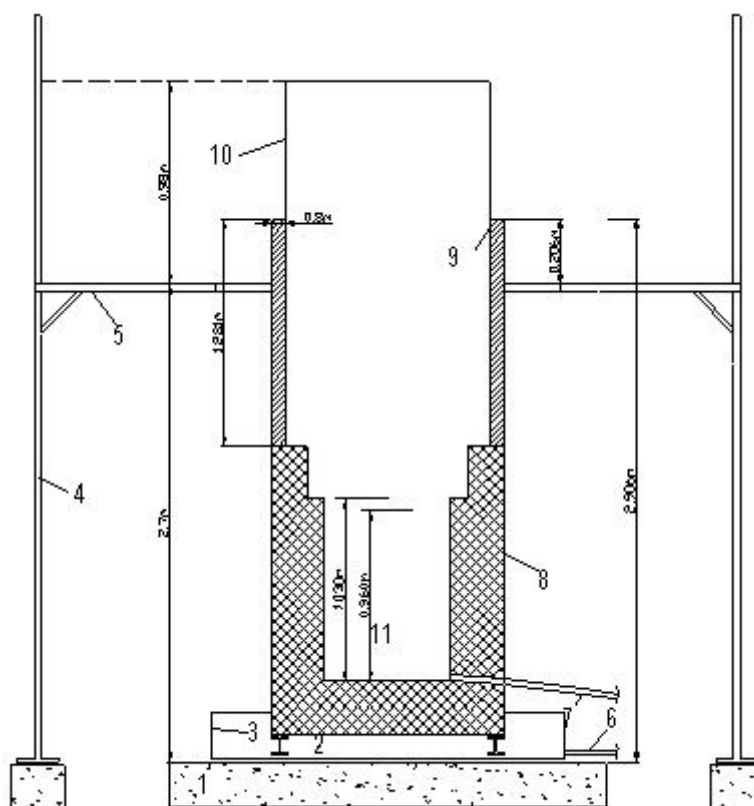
Loading station built around transport cask. Legend: 1=concrete base, 2=support for cask, 3=basin for liquid waste, 4=support structure, 5=working deck, 6=basin outlet, 7=cask outlet piping, 8=transport cask, 9=biological protection, 10=loading skirt, 11=basket.
